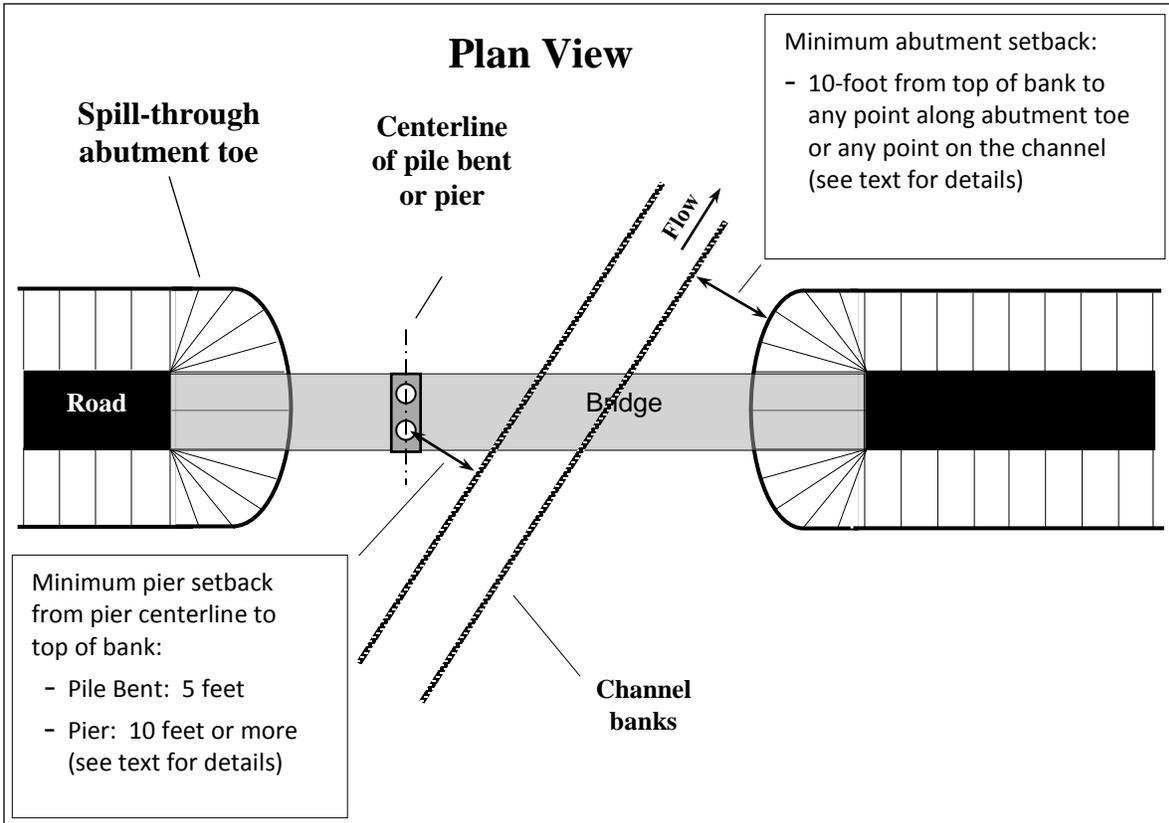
Illustration showing plan view for minimum setback distances in reference to the channel bank for spill-through abutments and floodplain piers.
